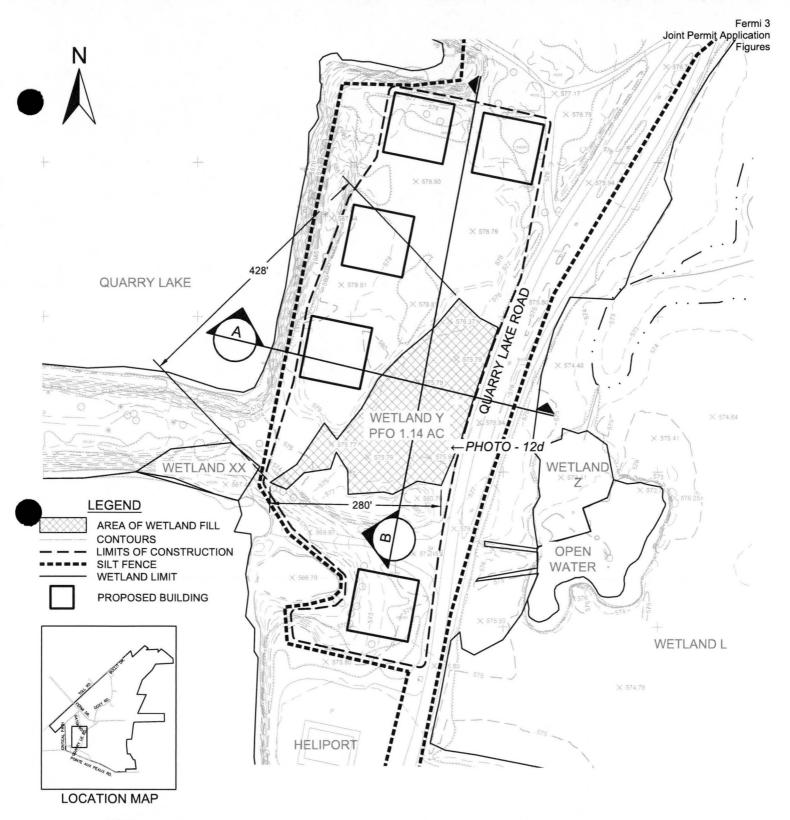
B CONSTRUCTION AREA 1 PLAN VIEW B
